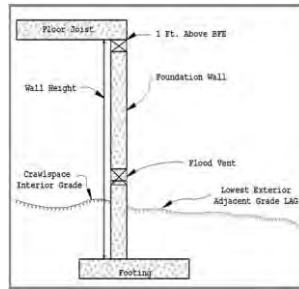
BELOW-GRADE CRAWLSPACE CONSTRUCTION
